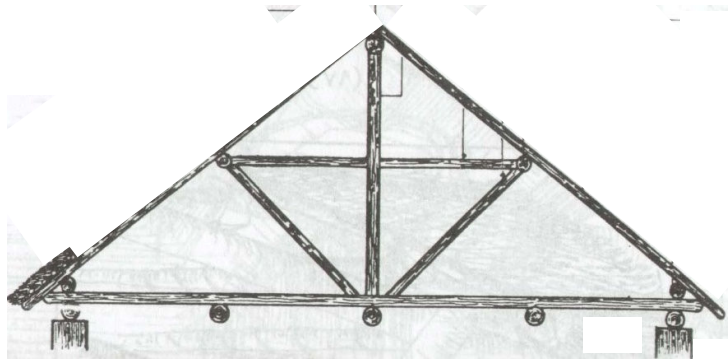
Thatched roof with wooden truss (Memarian.GH, 2006)
